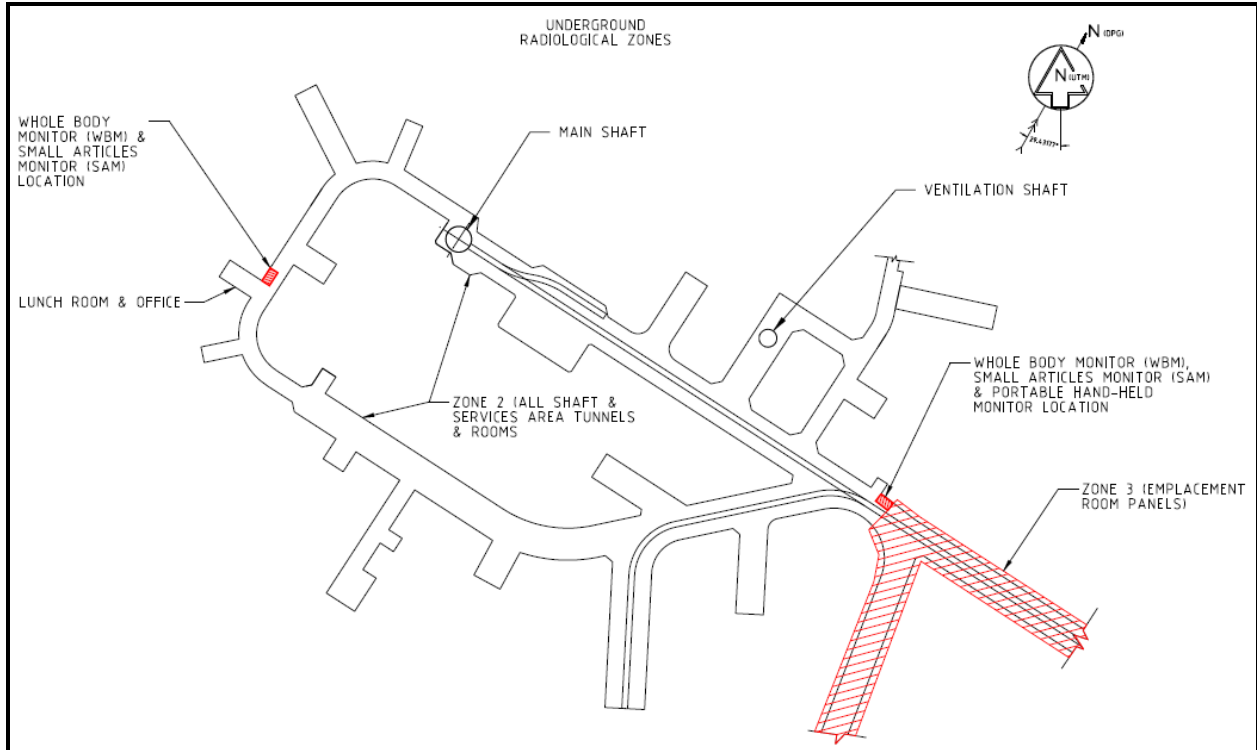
Plan of Underground Service Area Showing Radiological Zones
